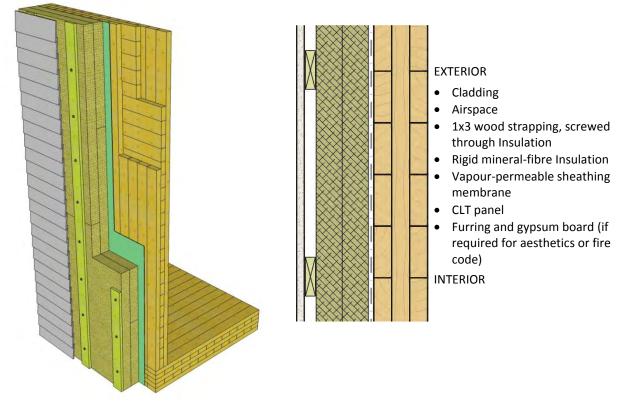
Exterior-insulated mass timber panel assembly (isometric sketch and plan view detail).
